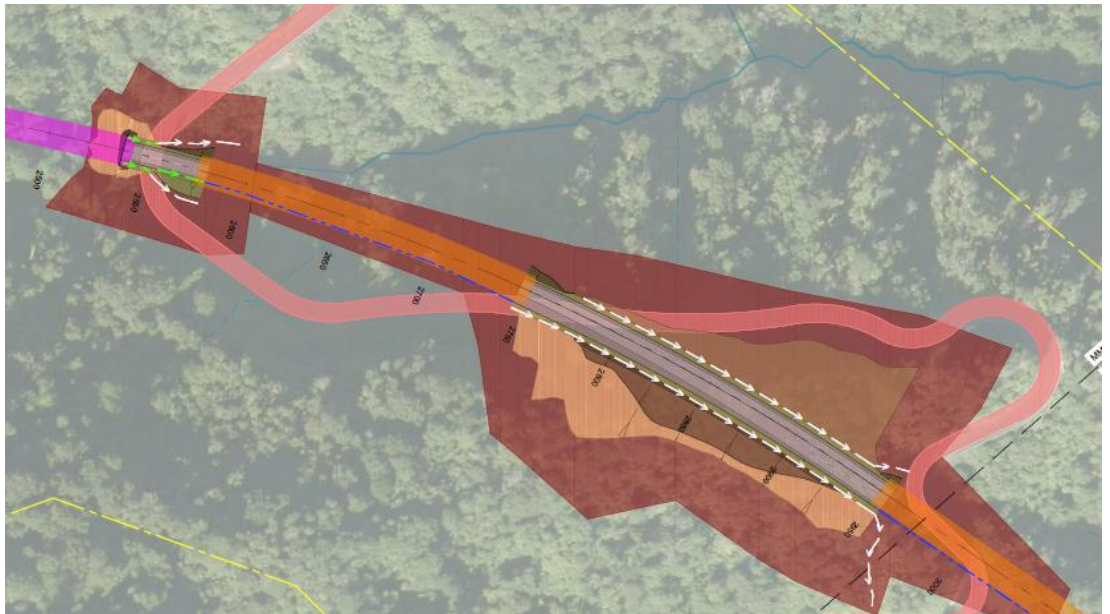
MCA2 – Online Z Option: Showing outline of construction footprint in tunnel, Bridges 1 and 2.
